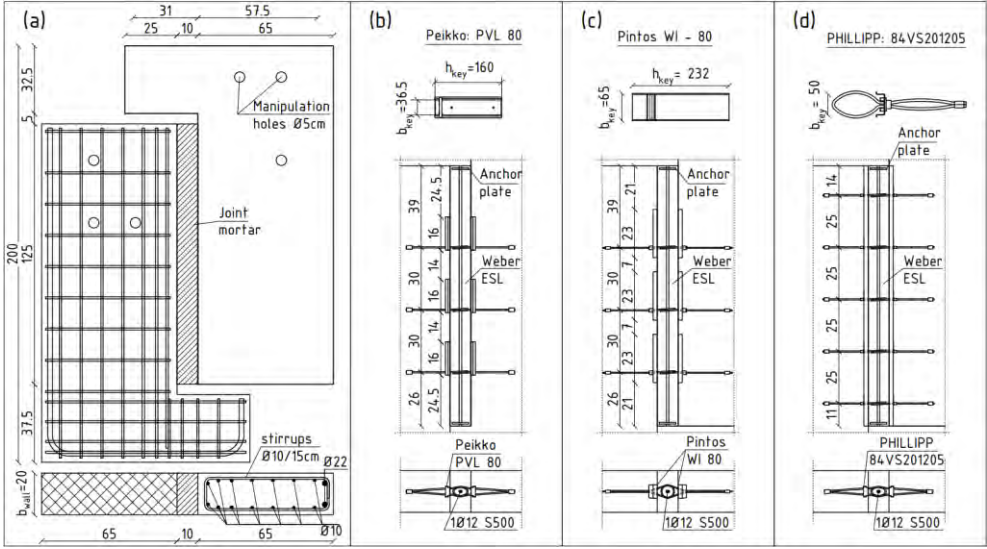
Test specimens' details [in cm]: a) Wall panels geometry and reinforcement; b) connection layout for specimens WL1; c) connection layout for specimens WL2; d) connection layout for specimens WL3
